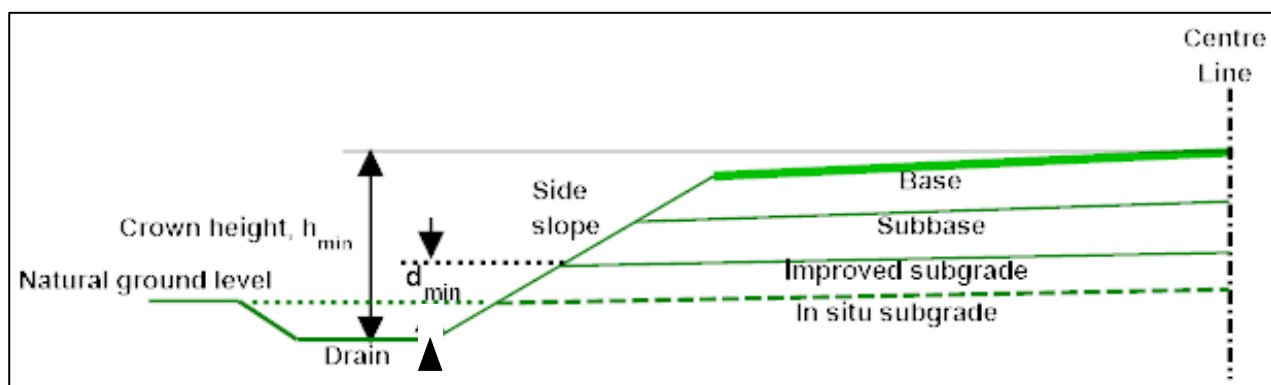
Crown Height for paved roads in relation to depth of drainage ditch
